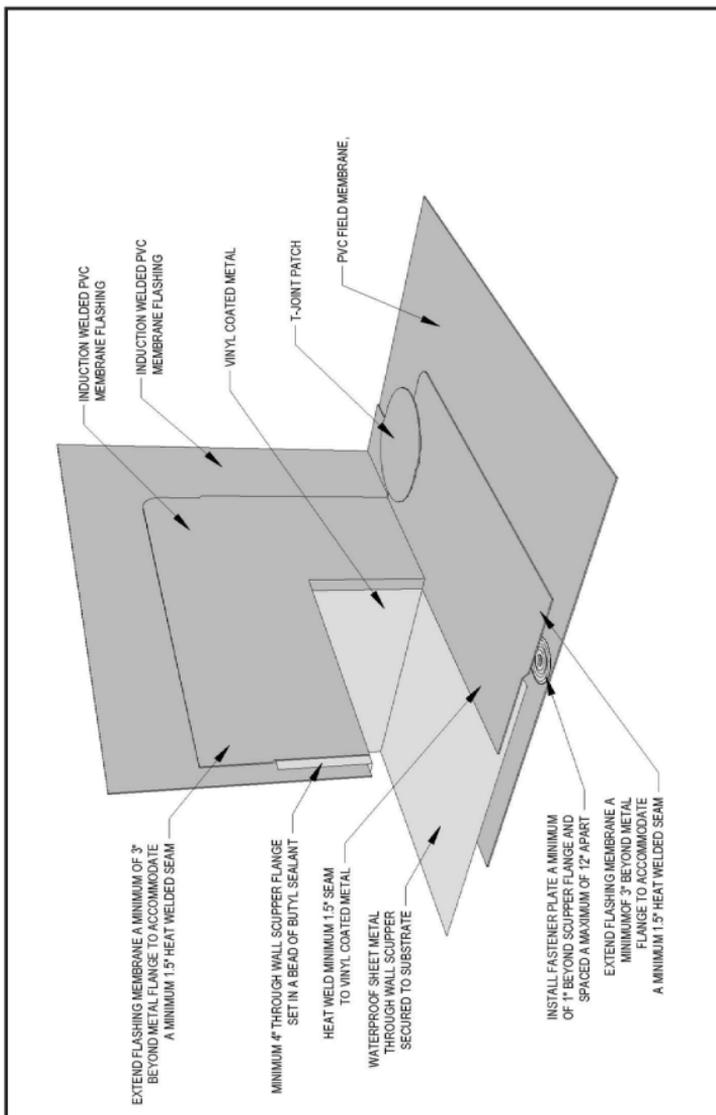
Induction Welded PVC Flashing Membrane At Through Wall Scupper
